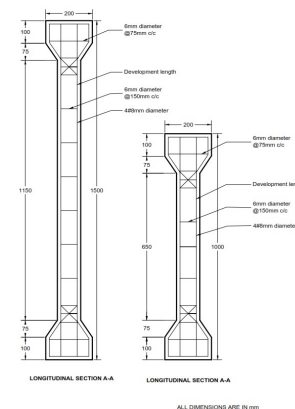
Schematic diagrams of Long column and short column showing reinforcement details
